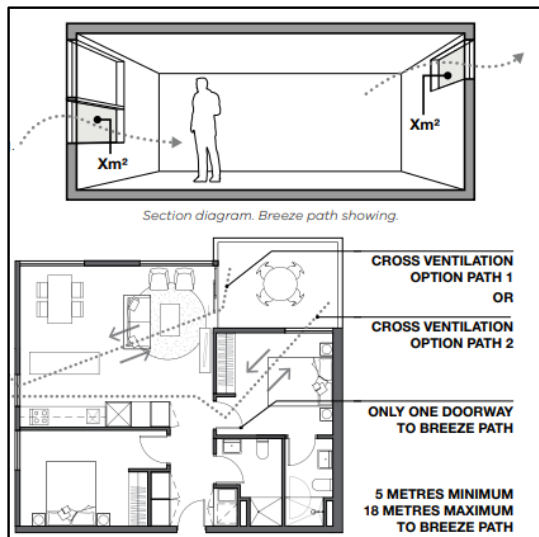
Examples of apartment design with consideration to cross ventilation (Image source: Apartment Design Guidelines for Victoria)
